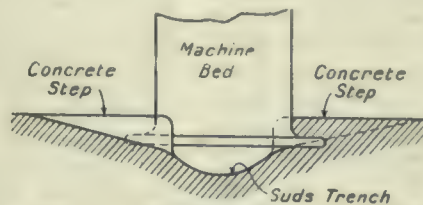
ATTACHMENT OF MACHINE TOOLS TO FLOOR.
